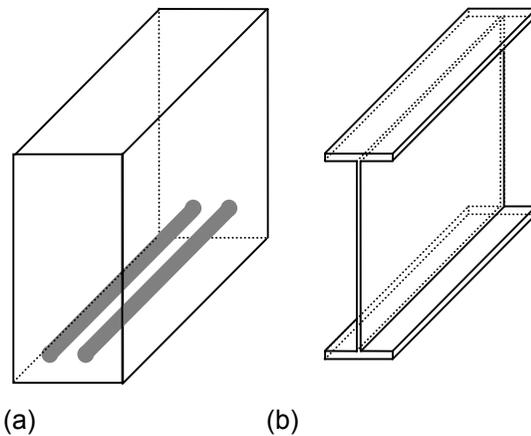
Schematic of structures: (a) reinforced concrete beam and (b) steel I-beam
